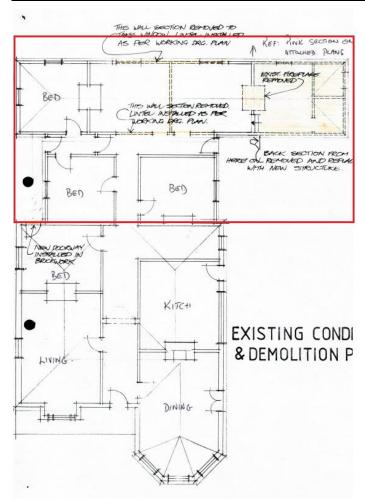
Floor plan for 7 Vears Road, Ashburton, with original timber section in red. (Source: City of Camberwell, Building Permit, 1987)
